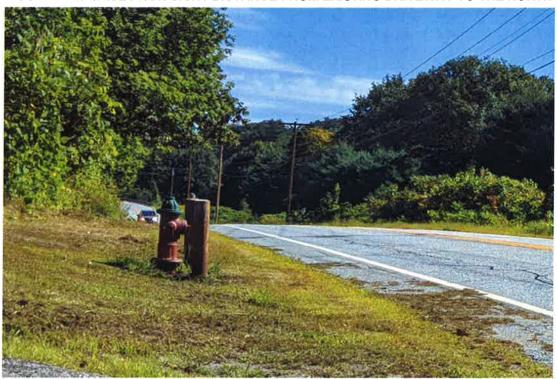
INTERSECTION SIGHT DISTANCE FROM EXISTING DRIVEWAY TO THE SOUTH
